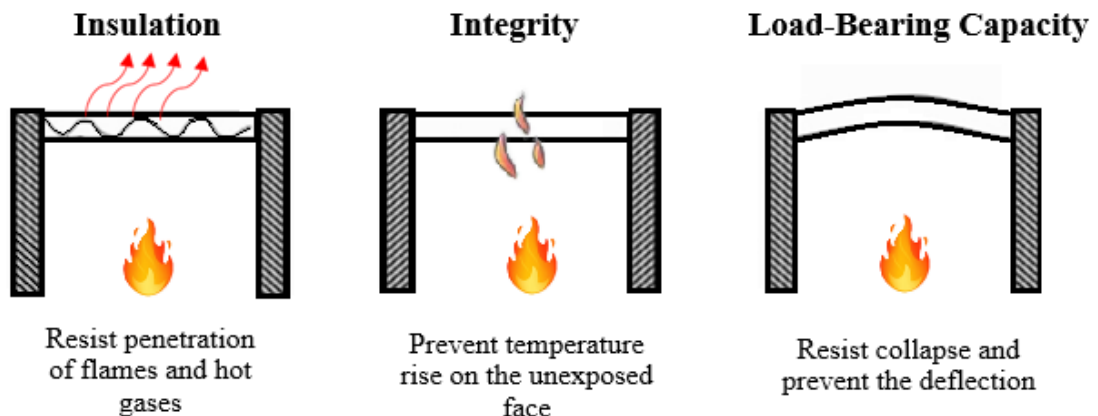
The concept of fire resistance test on roof and ceiling specimens.
